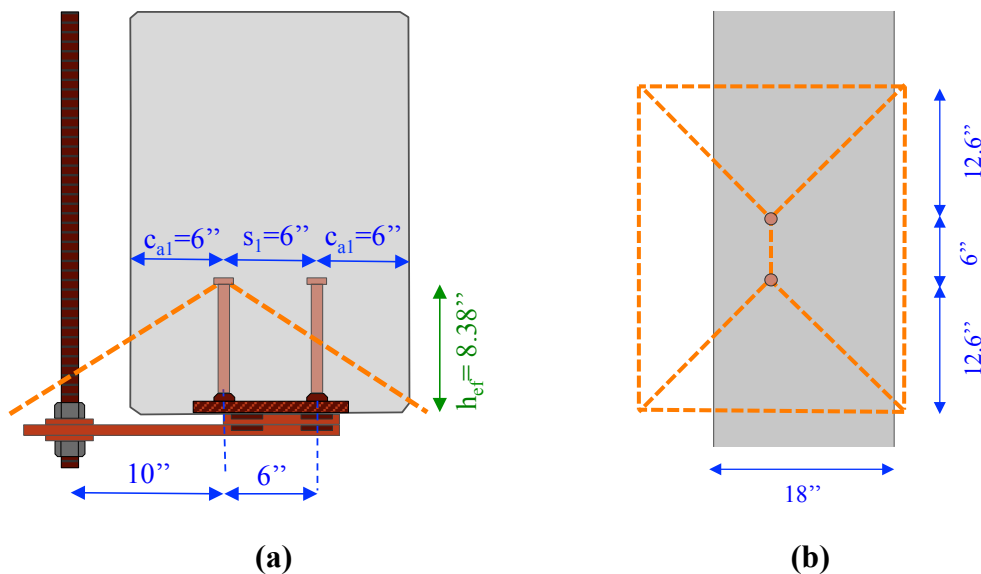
Detail of the column embed: (a) plan view and (b) elevation view
